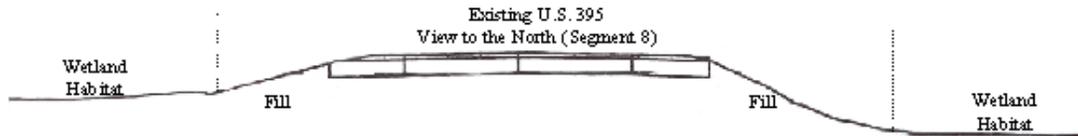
U.S. Highway 395 Cross-Section-Segment 8
